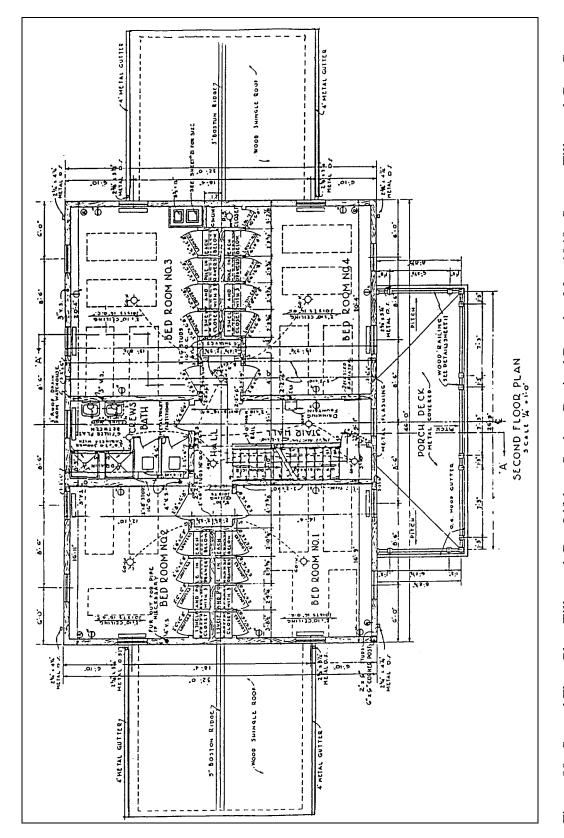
Second Floor Plan, Tillamook Bay Lifeboat Station, Revised Drawing May 1940. Source: Tillamook Bay Coast Guard Station National Register Nomination.
